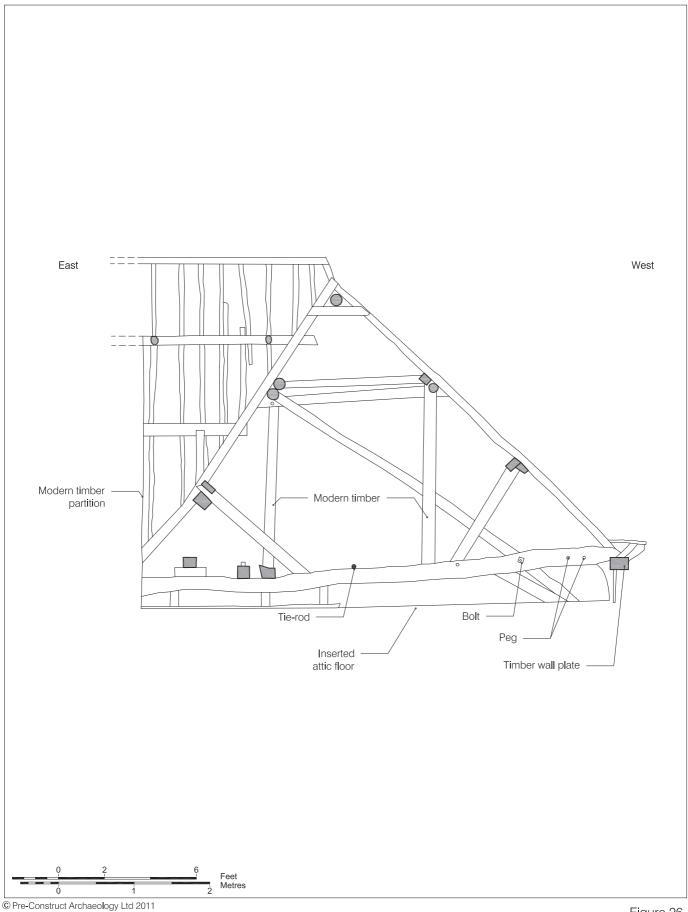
Section G-H through roof of north-south block of Maltings (Building 5) Looking south Musgrove Maltings, Baldock 1:50 at A4
